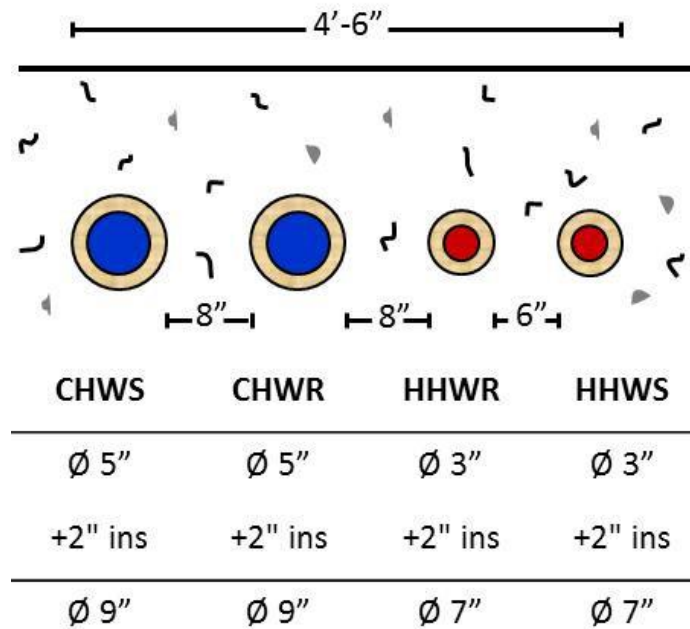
shows a cross section of an example layout for the main east-west distribution trunk seen running parallel to Brannon and Bryant streets in Figure 36. This example shows that the total trench width needed for a 4-pipe system, including pipes, insulation, and separation between pipes approaches 8 feet.
